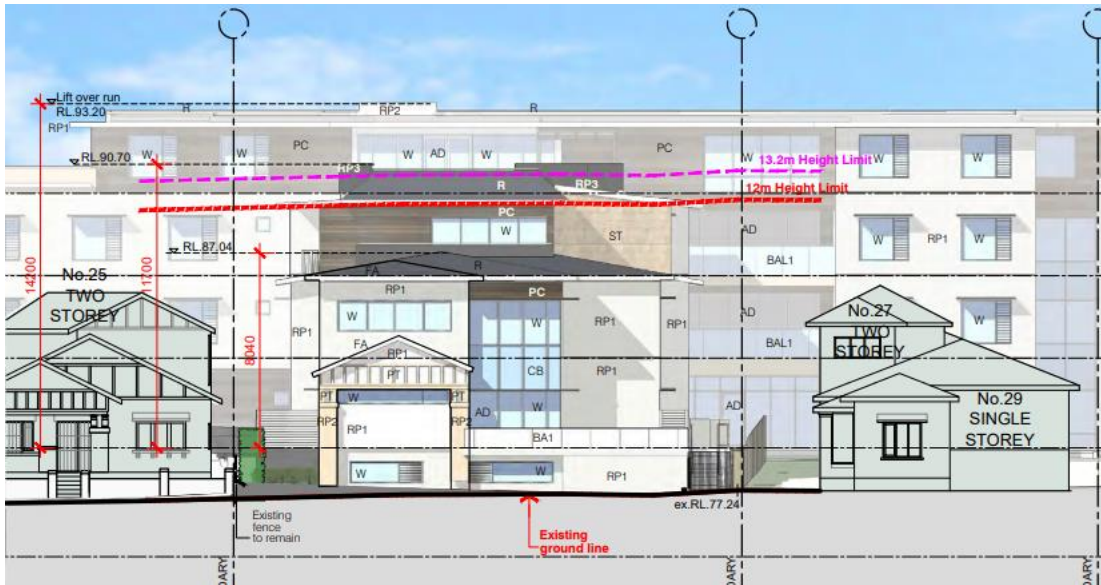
North Elevation (McLennan Avenue frontage) Dwg No. DA13, Rev C dated 15 July 2021.
